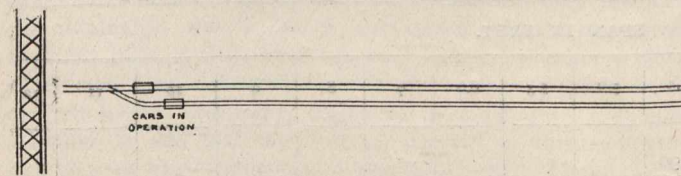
Street Rails with Load near to the Structural Ironwork.
